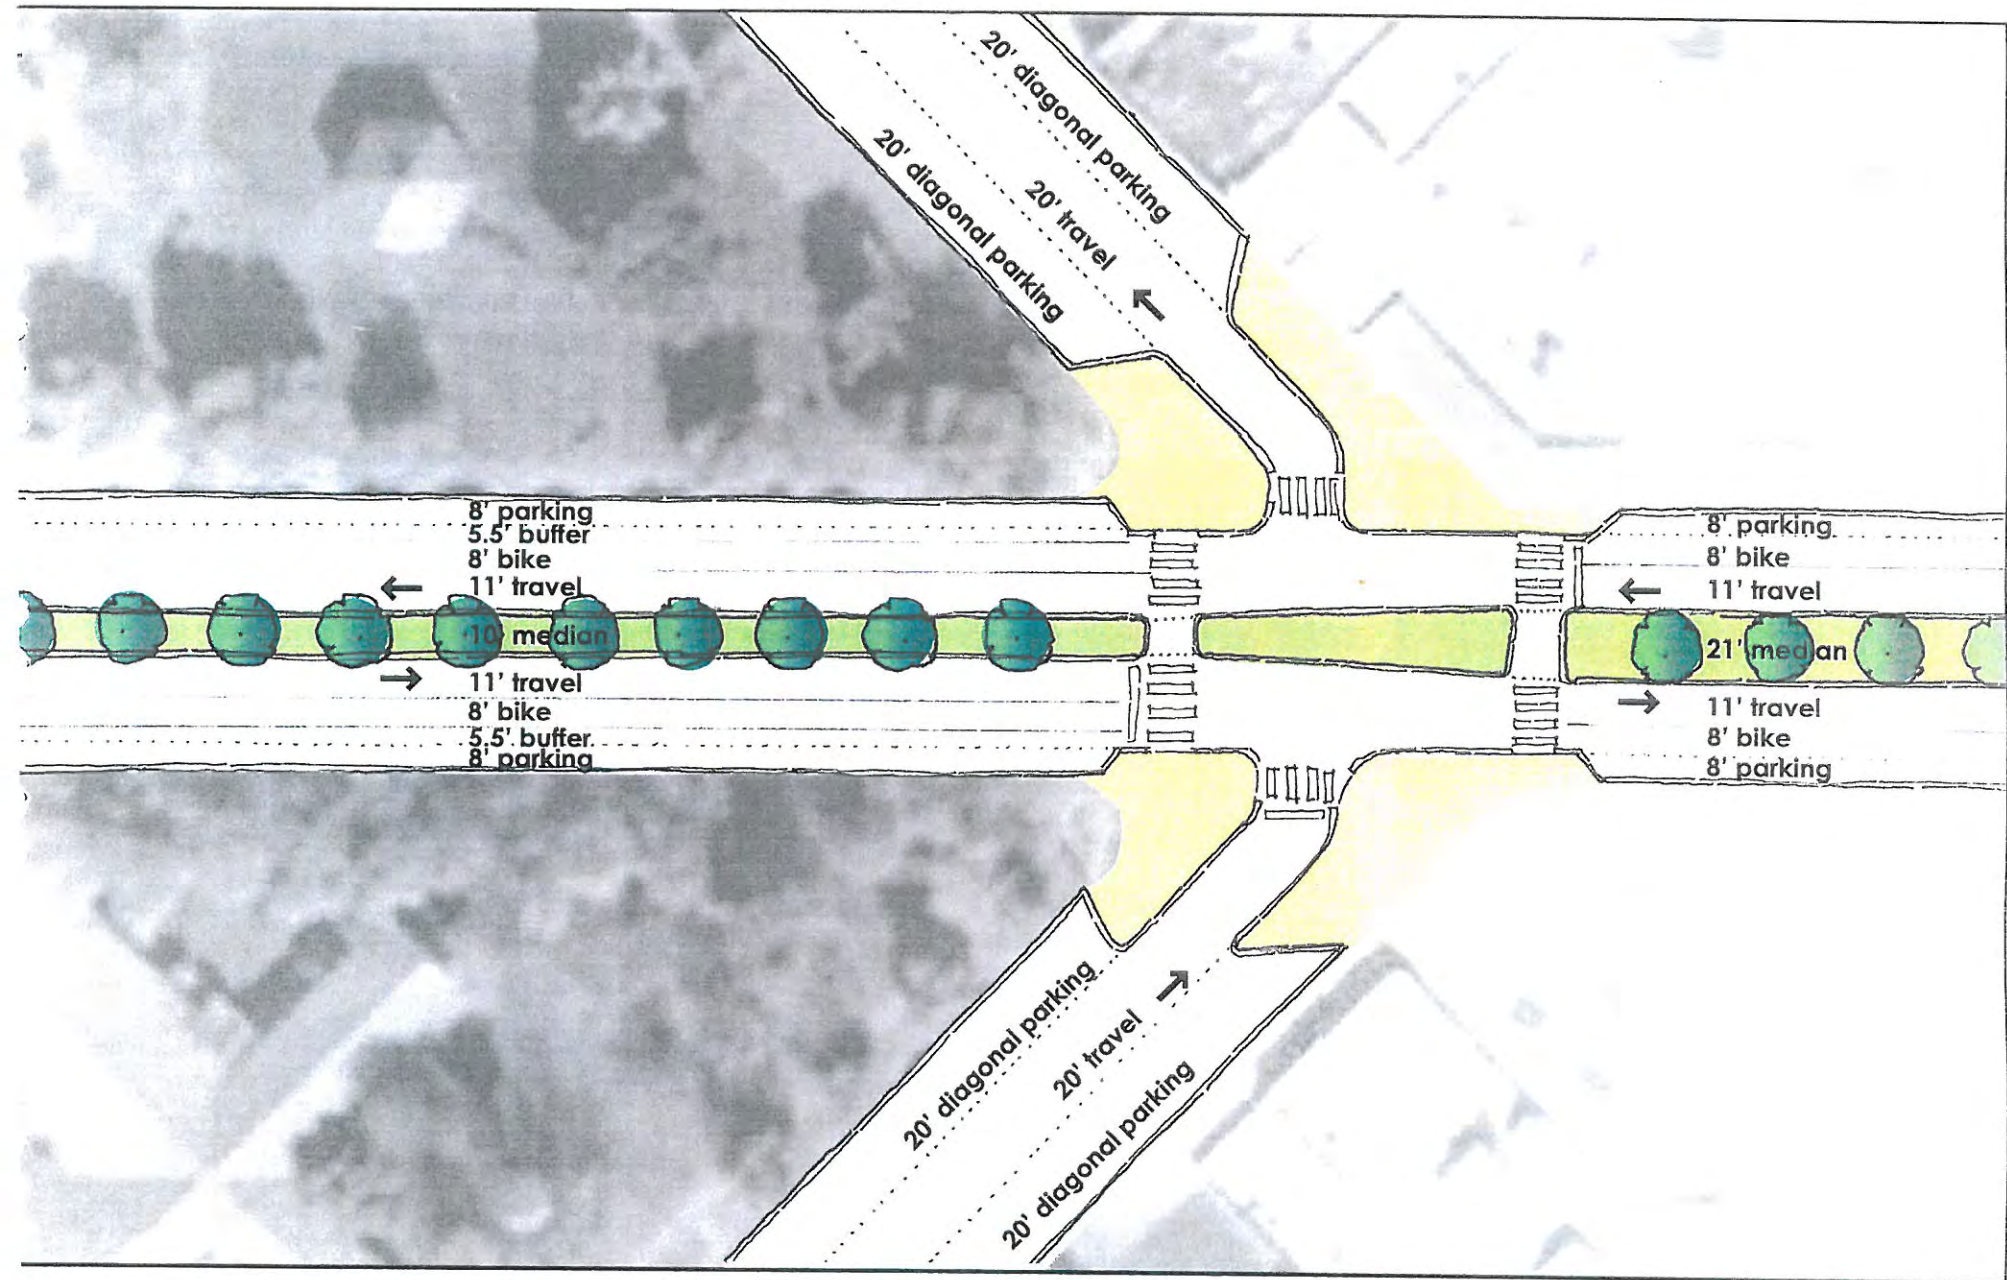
Short-term recommendations for Main Street through Plaza Park.
